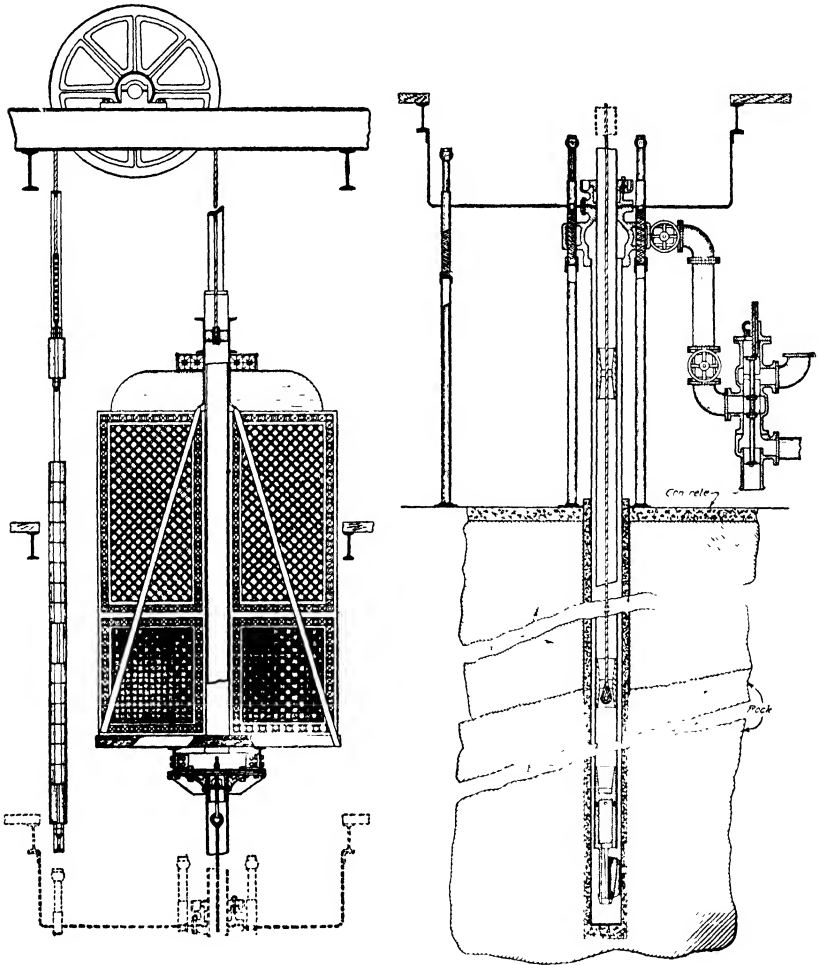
Details of Cylinder and Plunger of Hydraulic Elevator
